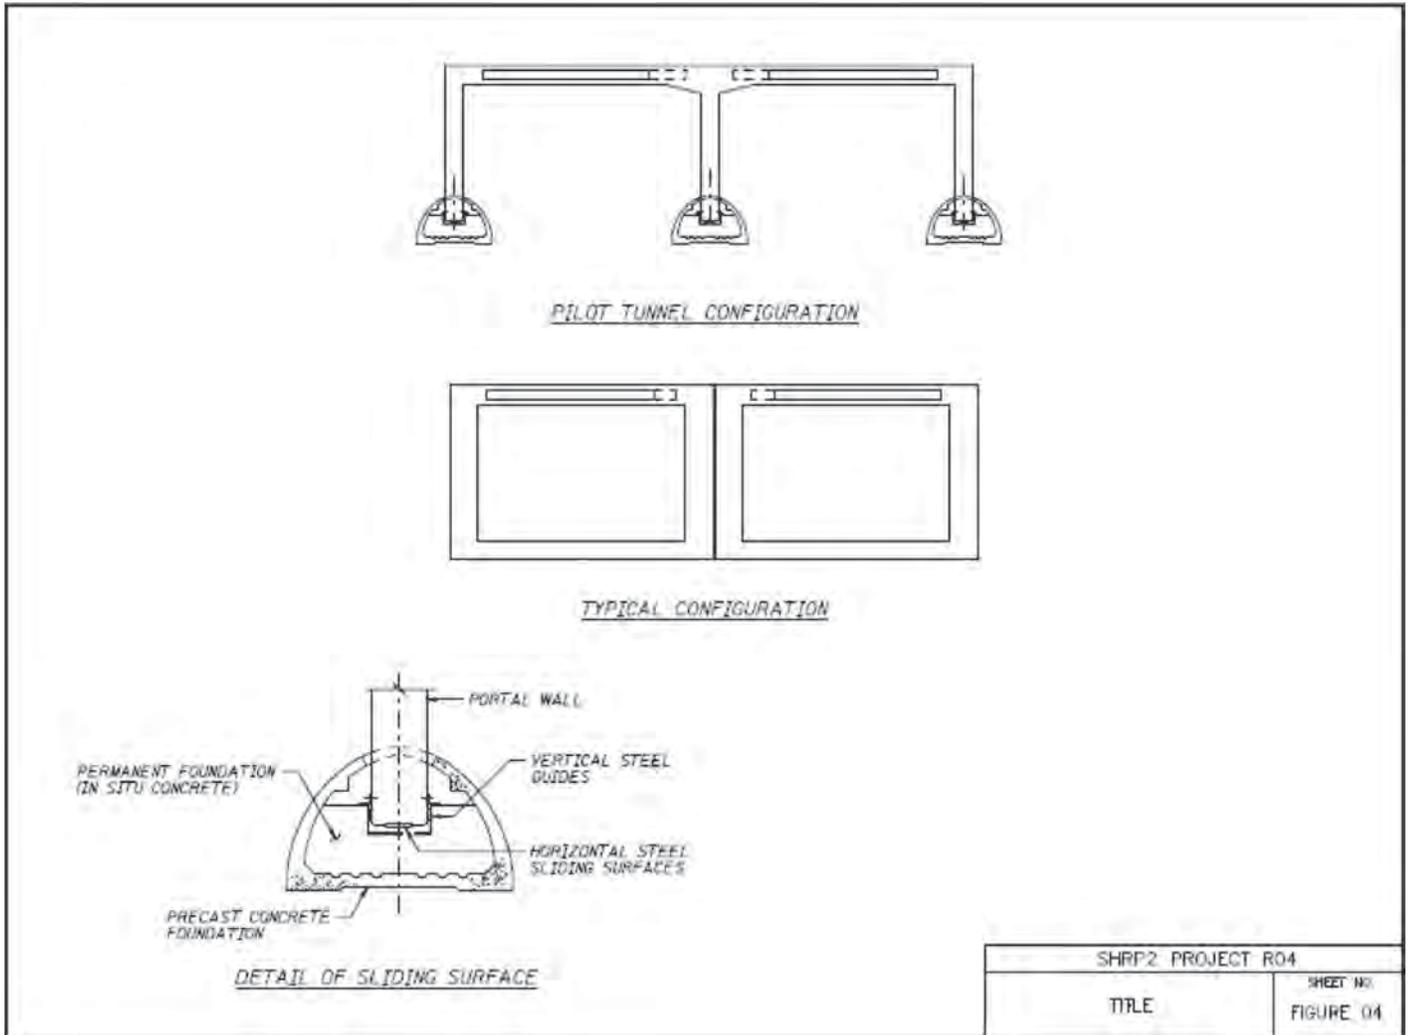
Typical pilot tunnel configuration and sliding surface detail.
